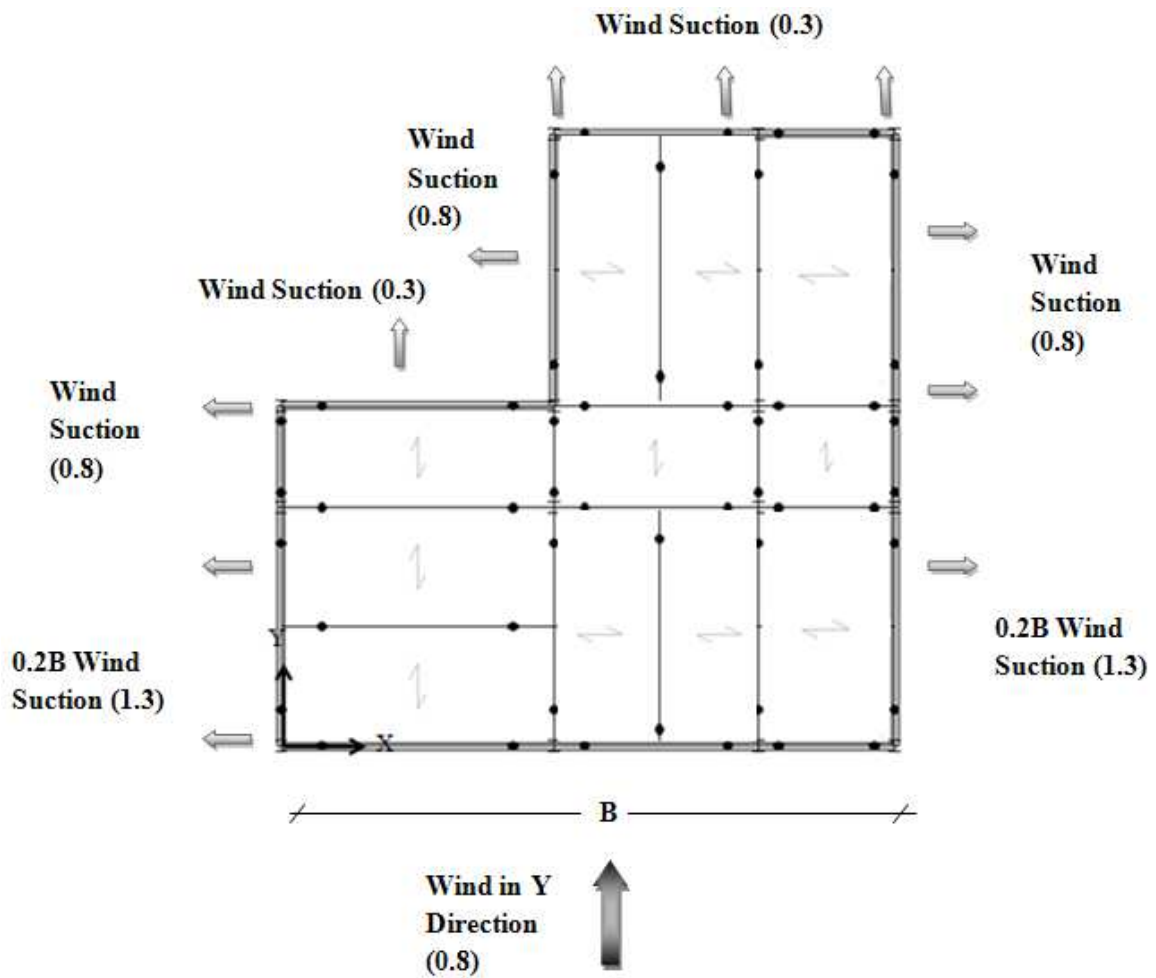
(b): Building layout indicating wind in Y direction with suctions for asymmetrical plan and symmetrical section.
